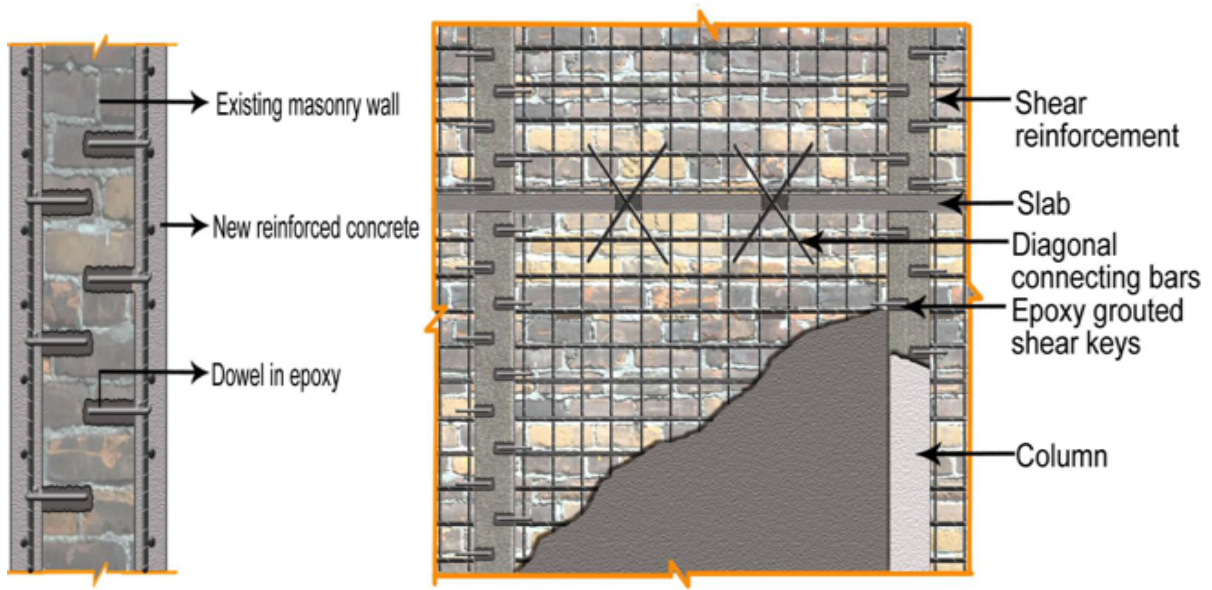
detail of retrofitting procedure for Stone wall (credit: TESRA ppt)
